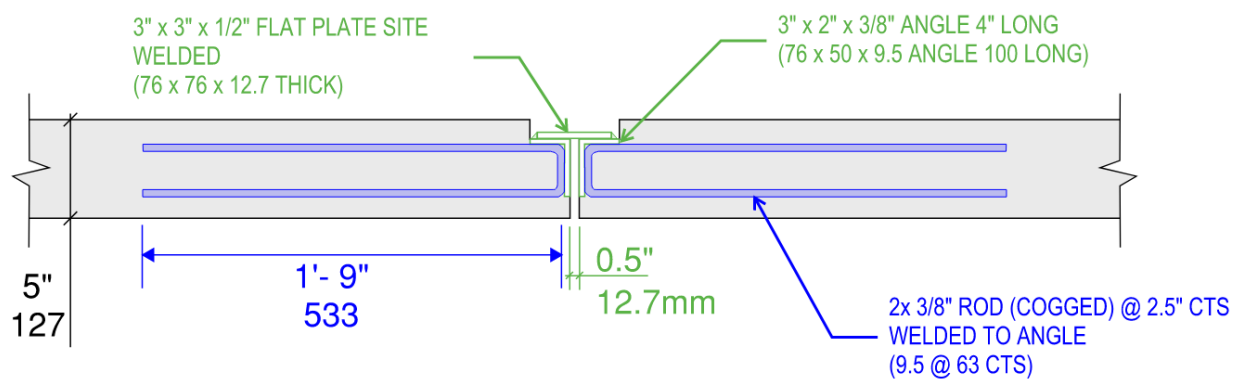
Typical pre-cast panel-to-panel joint connection detail (joint parallel to direction of span)
